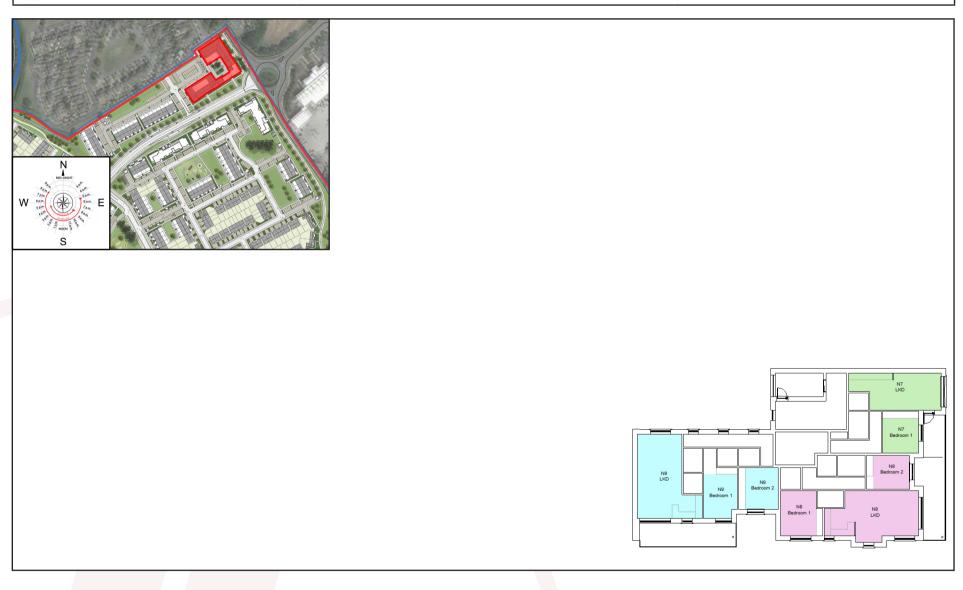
Floor plan of assessed building (Below), Keyplan highlighting the assessed building (Above).
